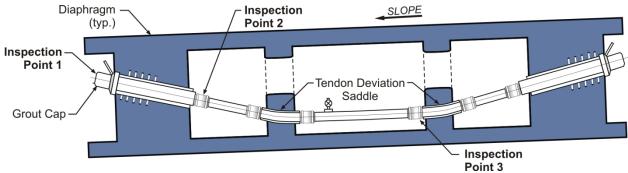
Illustration. Typical span-by-span bridge external tendon inspection point locations.
